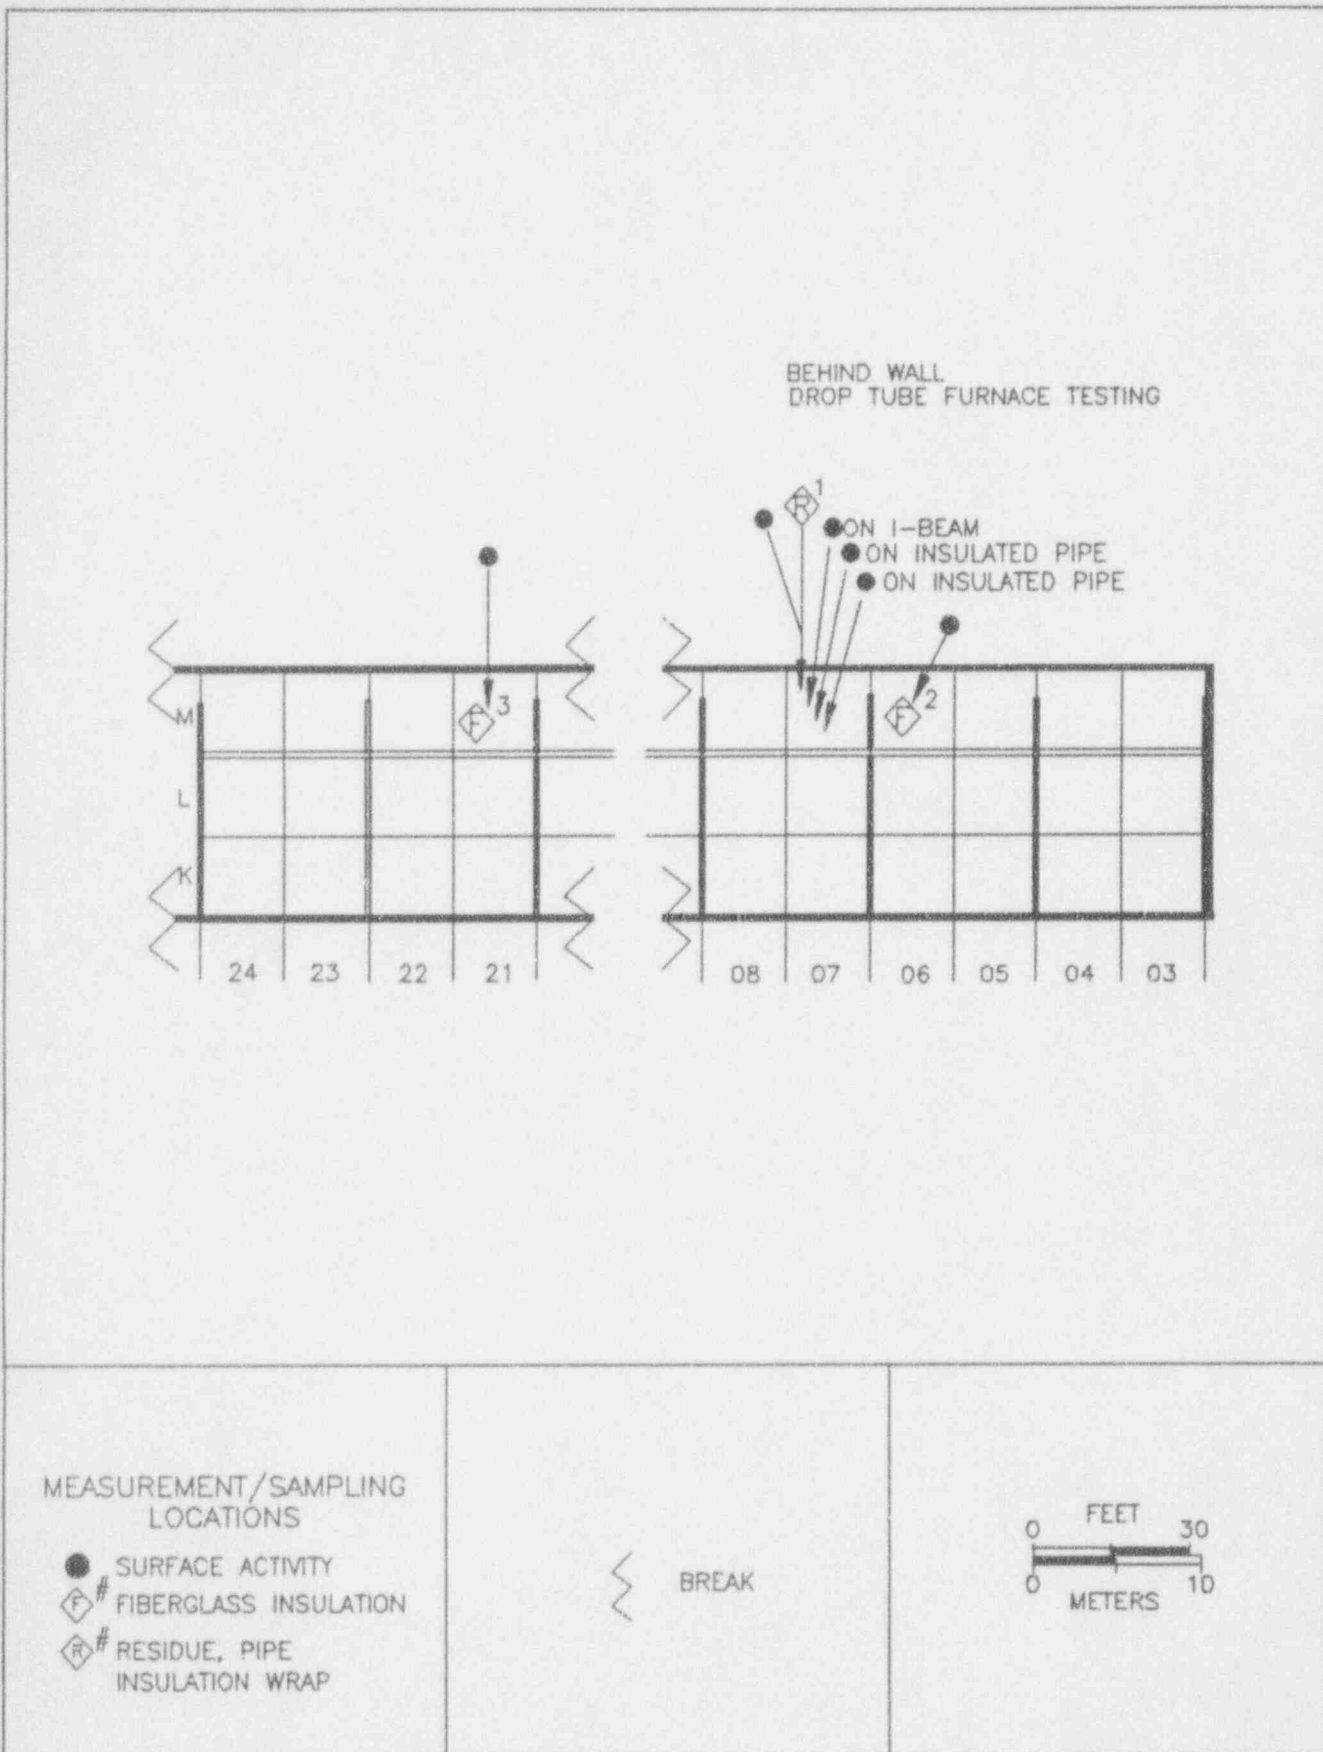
Building 3, West Wall Above Crane Rail – Measurement and Sampling Locations
